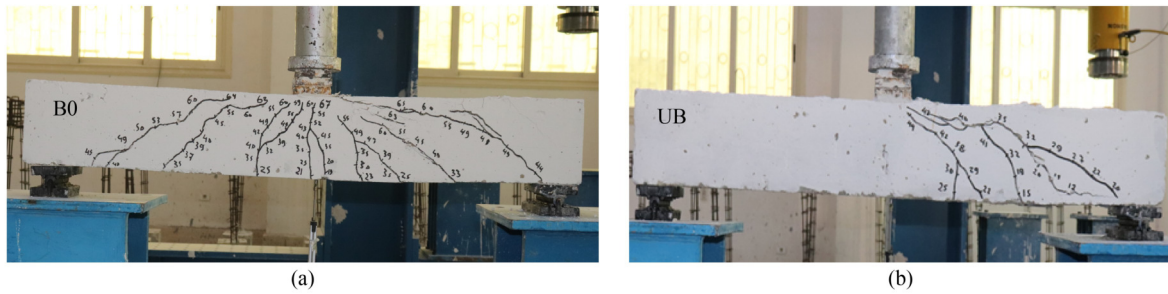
Crack patterns of G1: (a) control beam; (b) non-stirrup beam.
